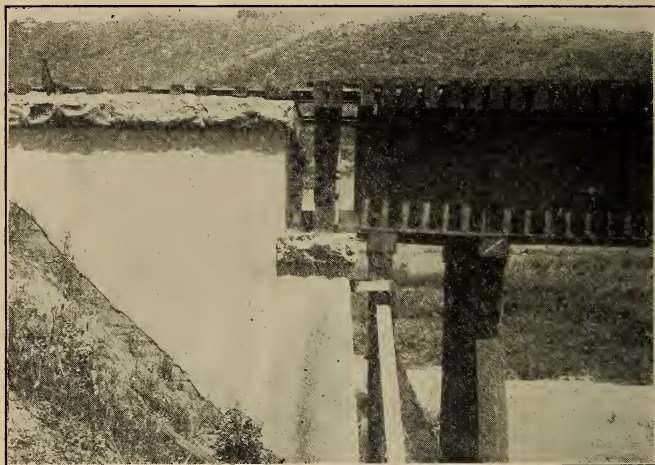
West Abutment, Pájaro River Bridge, Southern Pacific Railroad.
